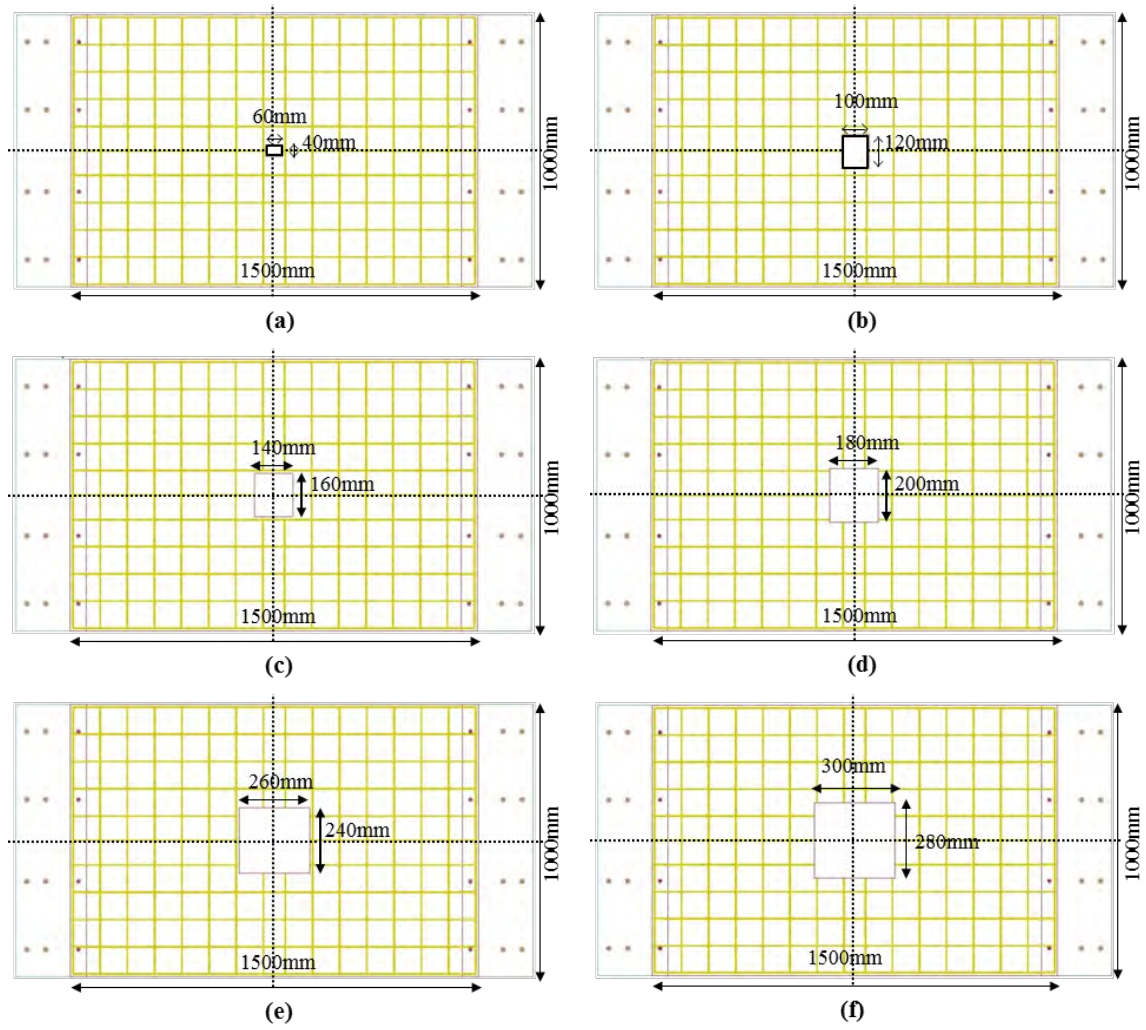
Details of opening sizes and reinforcement configuration-unstiffened openings (rotated front view)
